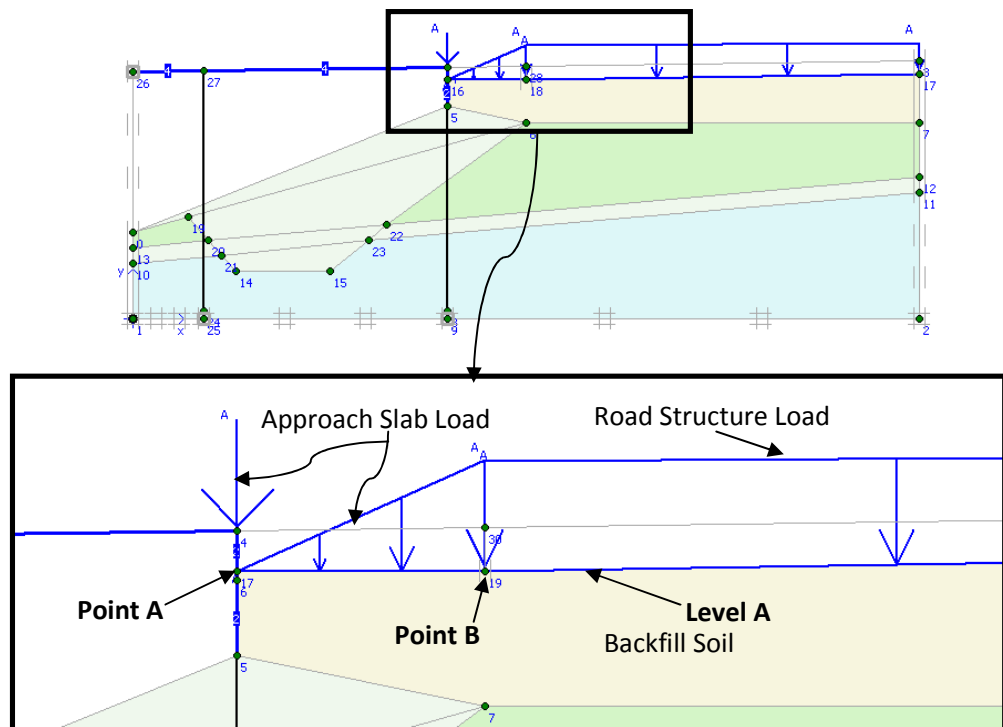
Location of distributed load modelling road structure and approach slab within backfill soil and abutment structure
